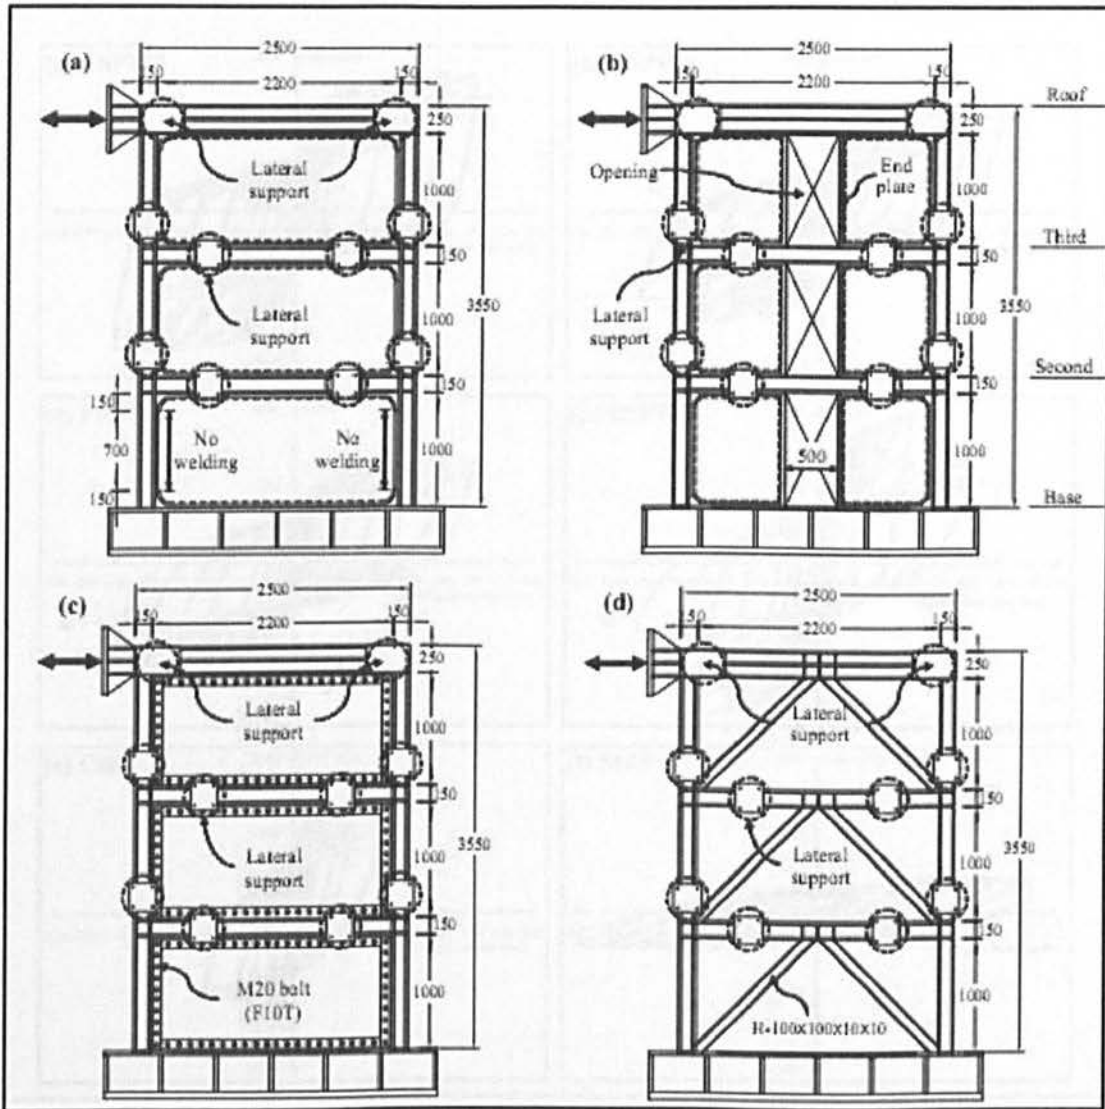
Different configurations of test specimens tested by Choi et al. (2008) for (a) Partially connected steel plate, FSPW4 specimen, (b) Coupled wall, FSPW5 specimen, (c) Bolt-connection, BSPW2 specimen, (d) CBF specimen
